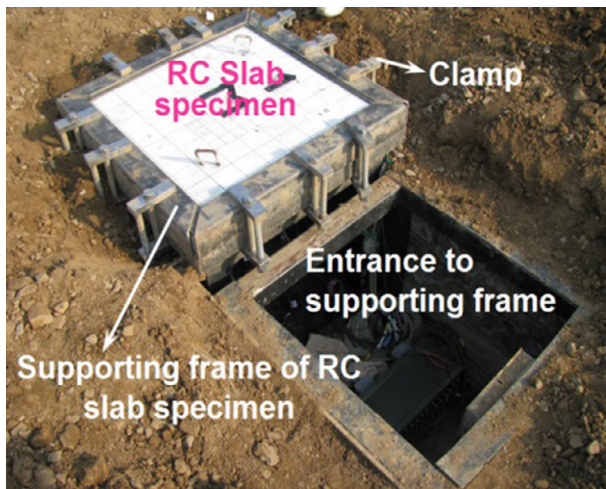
Supporting frame and specimen (blast experiment) [1].
